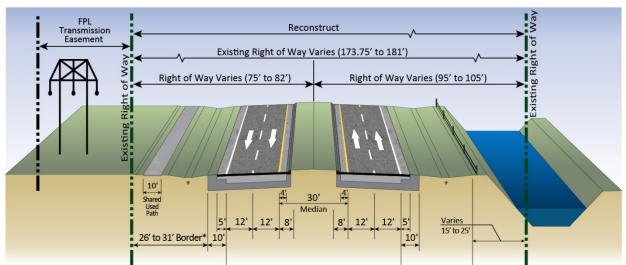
SR 29 Typical Section from Seminole Crossing Trail to New Market Road (Central Alternative #1 Revised)
